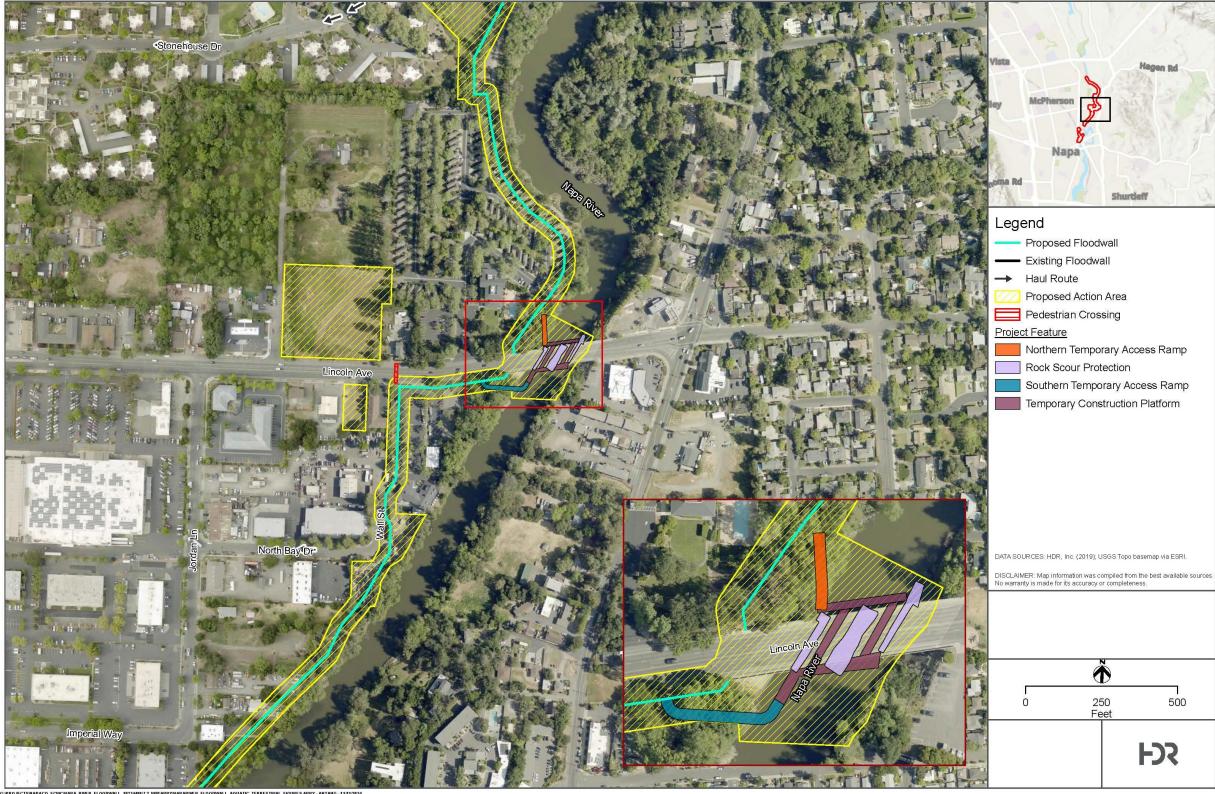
Proposed Action Alternative (2 of 5)
